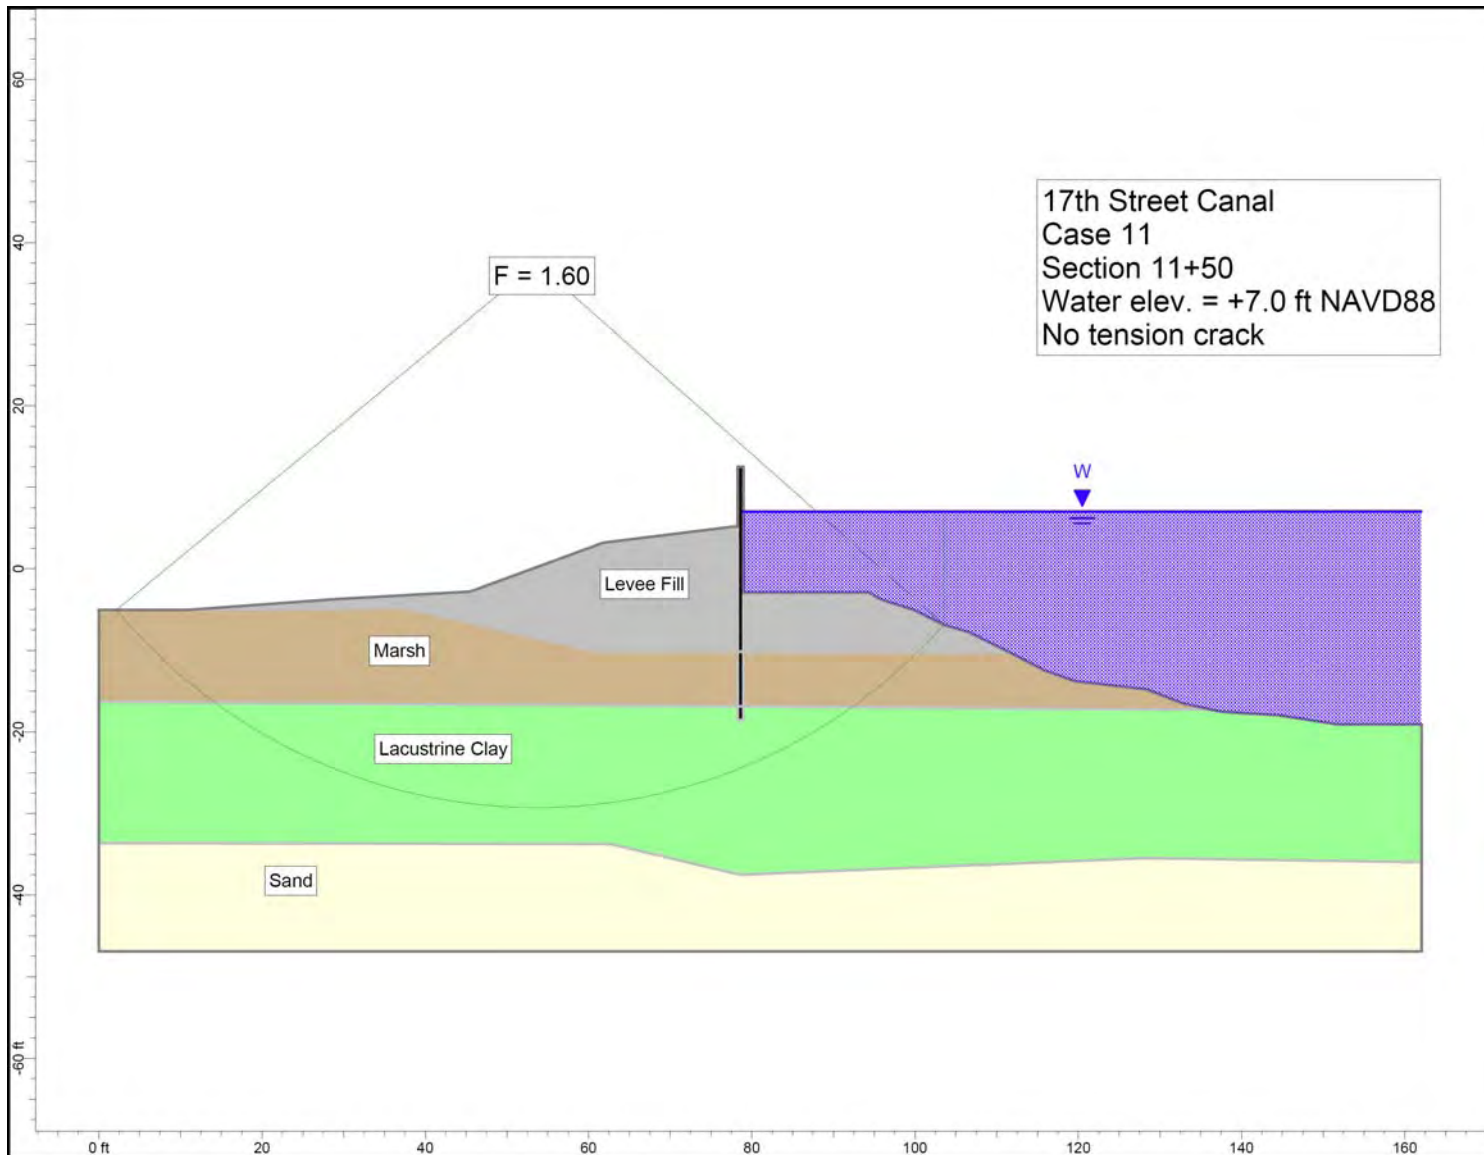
Critical Circle for 17th Street Canal Station 11+50 – Water Elevation 7 ft, No Tension Crack
